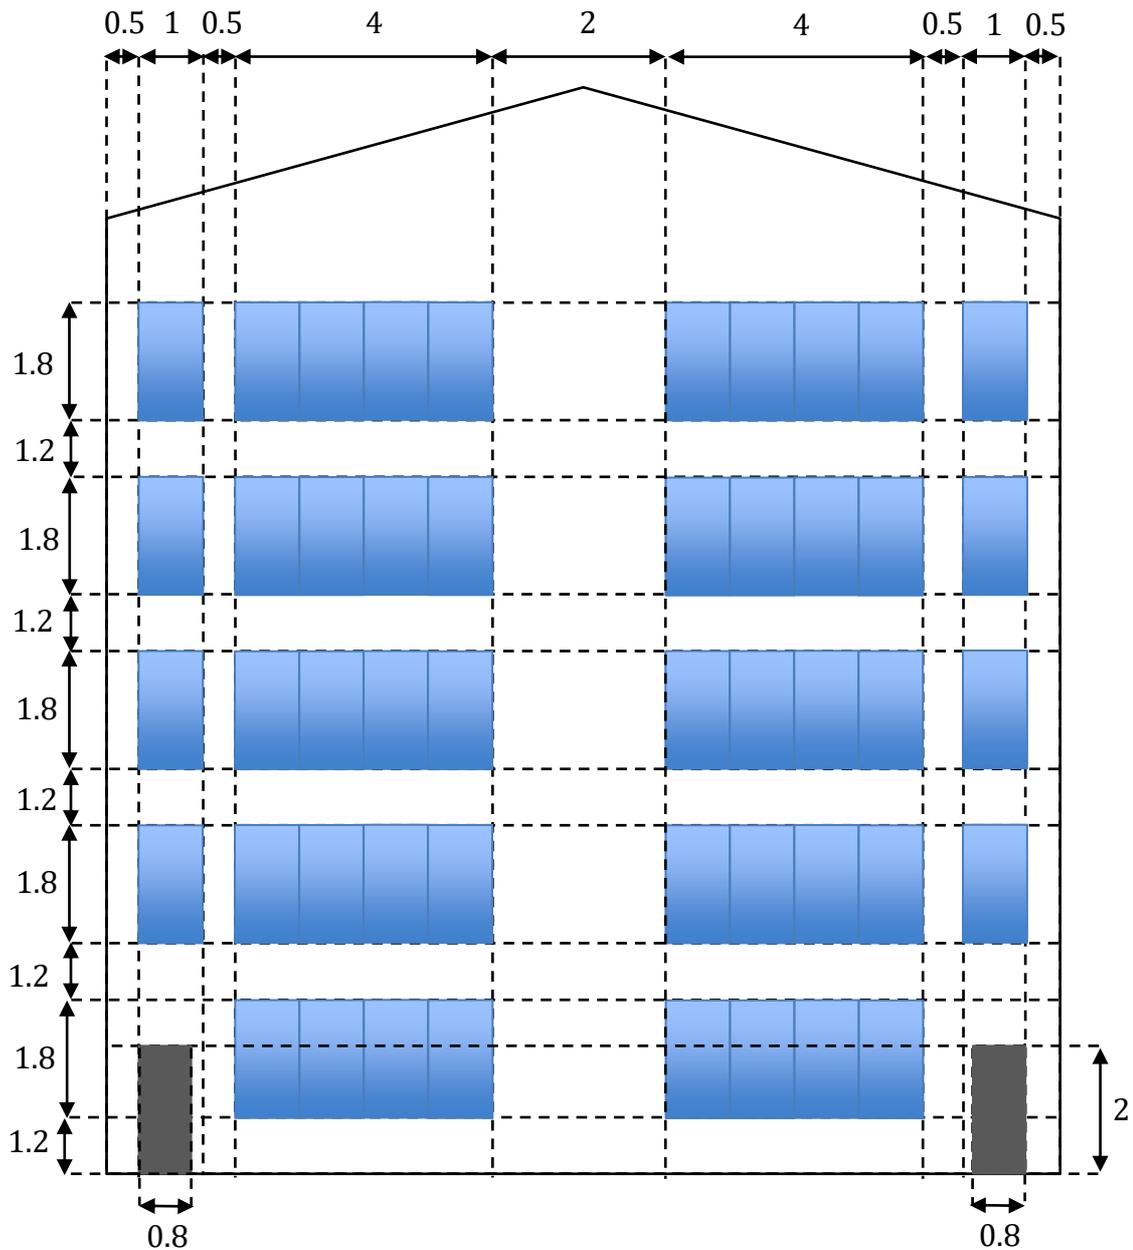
Placement and geometry of windows and doors on exterior walls, where the measurements are expressed in meters.
